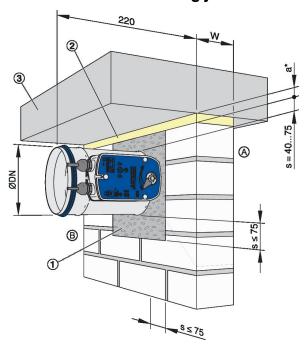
Mortar-based installation in a solid wall with flexible ceiling joint
